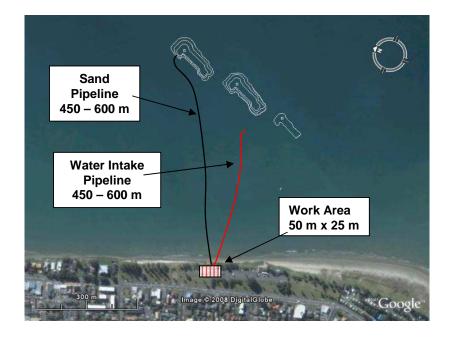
Approximate scale of construction area and extent of pipelines necessary for reef construction.
